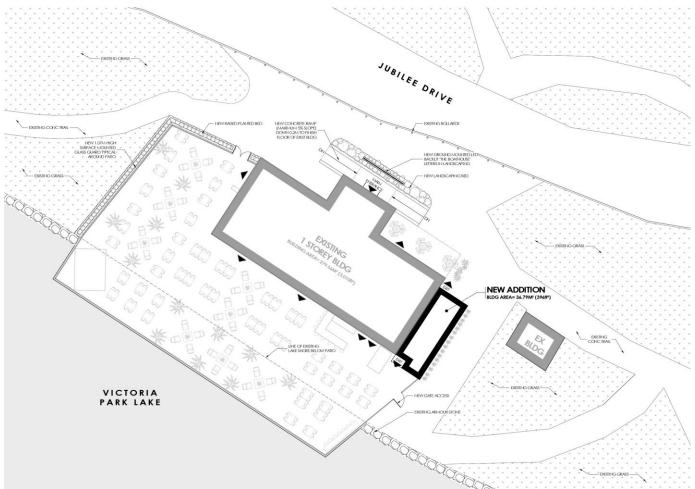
A proposed site plan which has been submitted as part of this heritage permit application.
